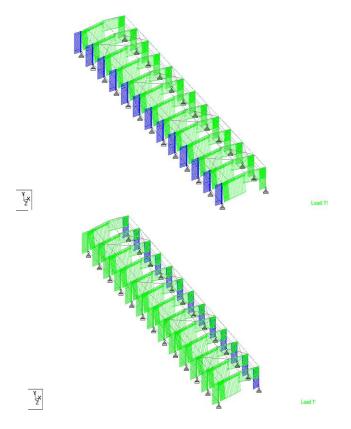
Wind load acting on Wall A Wind load acting on Wall B
